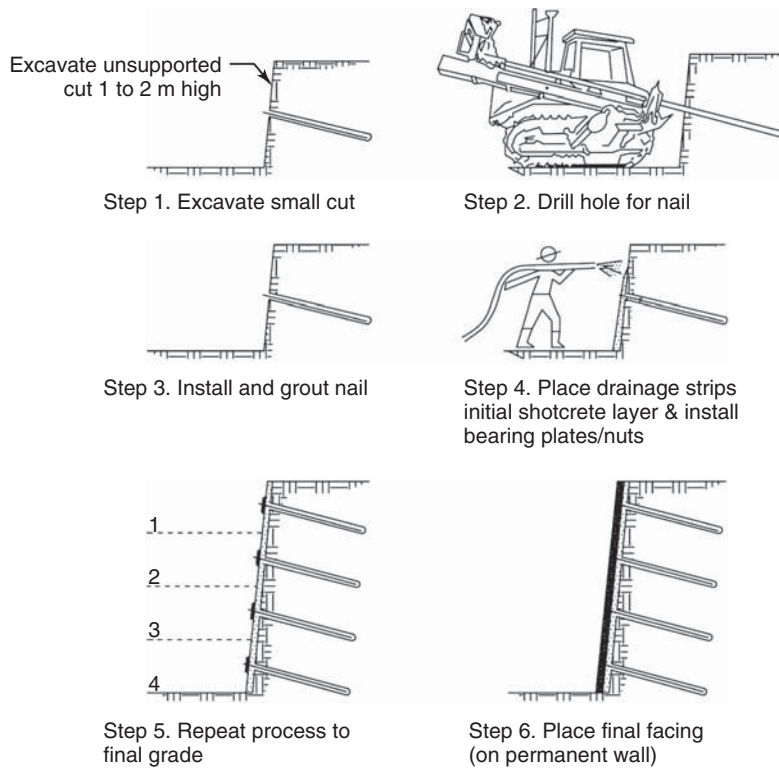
Soil nail wall construction sequence (FHWA 1998).
